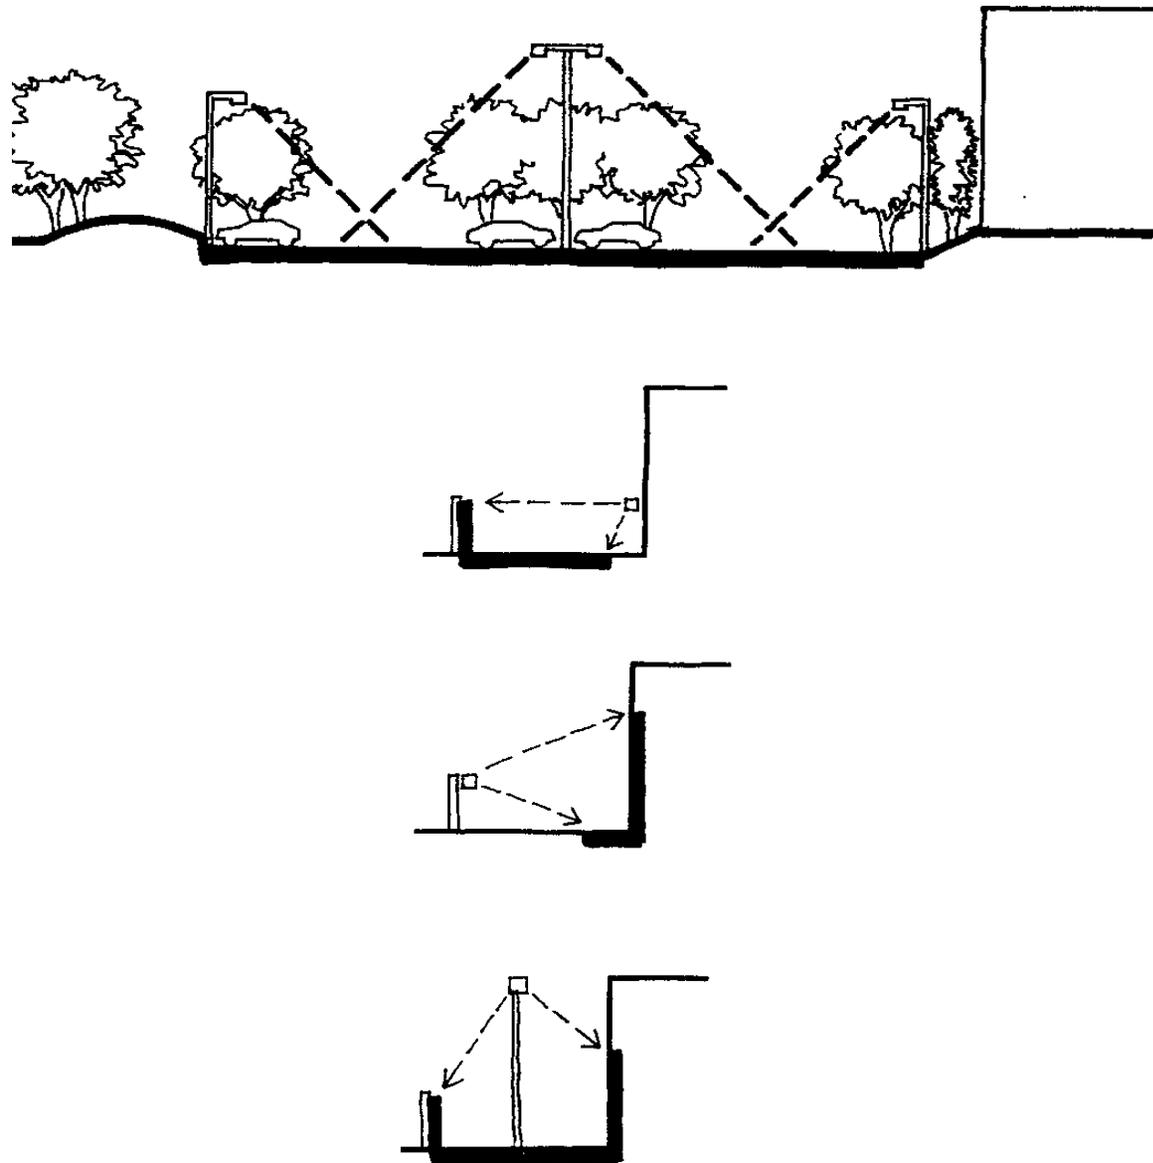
Lighting of Parking, Service and Loading Areas
